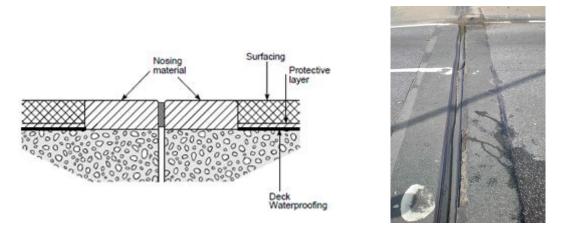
Nosing joint with poured seal (left) and its surface damage (right)
